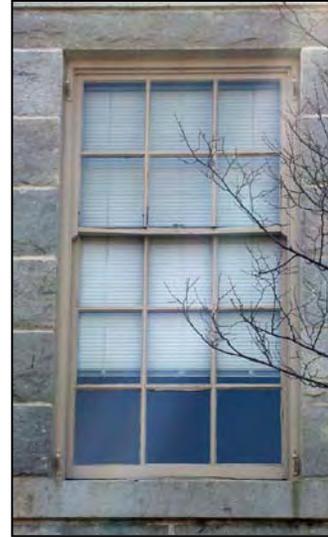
Representative basement-story windows (W002 and W003) in the north elevation of the U.S. Custom House (2008).
